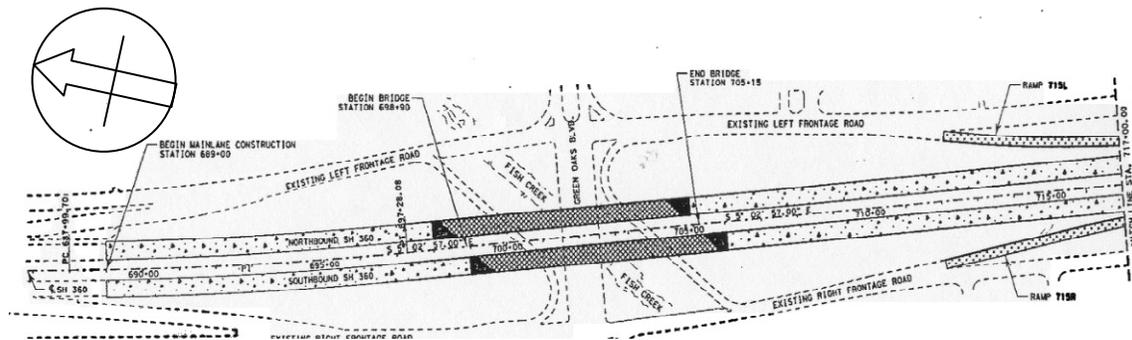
Details of ECS Bridge Site, SH 360, Arlington, TX
